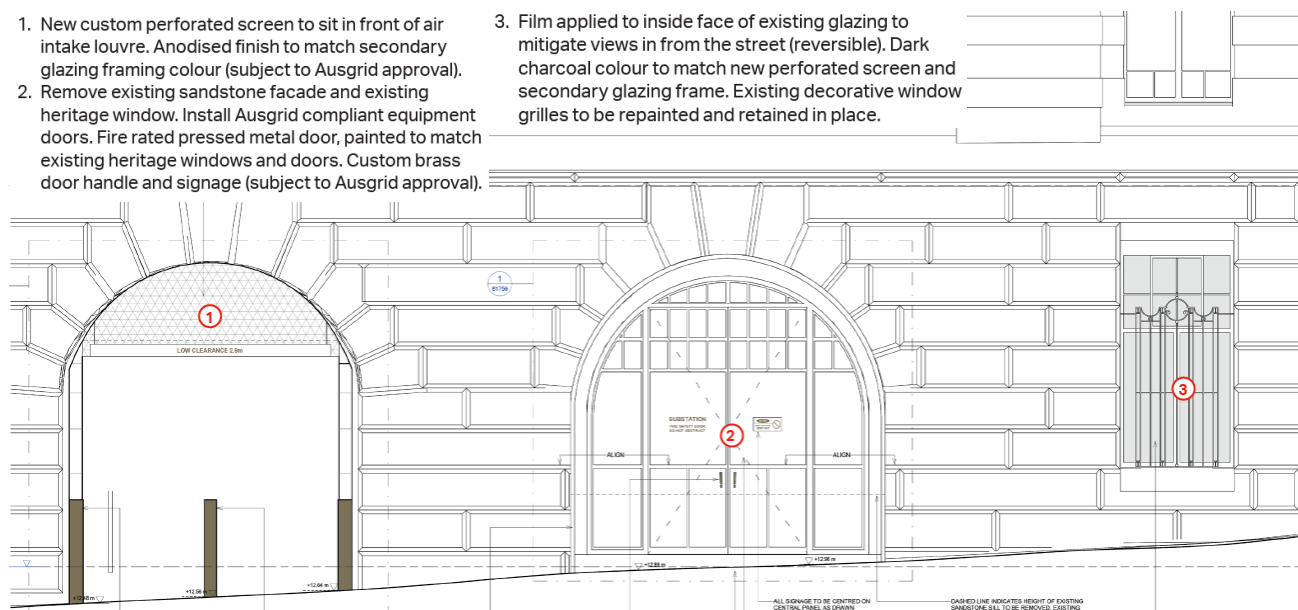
The proposed substation equipment door next to the Loftus Street Laneway
